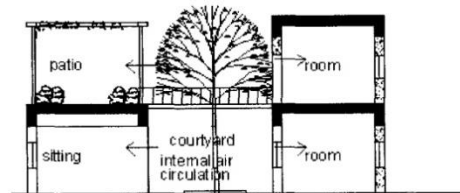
Section through the building shows the air circulation and the interesting spaces within the structure.
